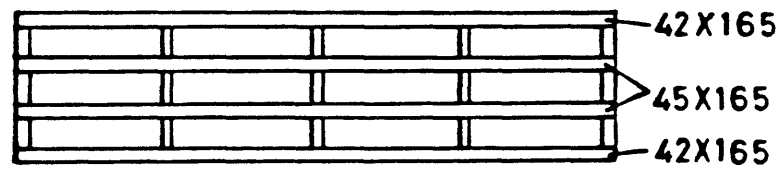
1 3 Construction detail of the tested house (Type B).
